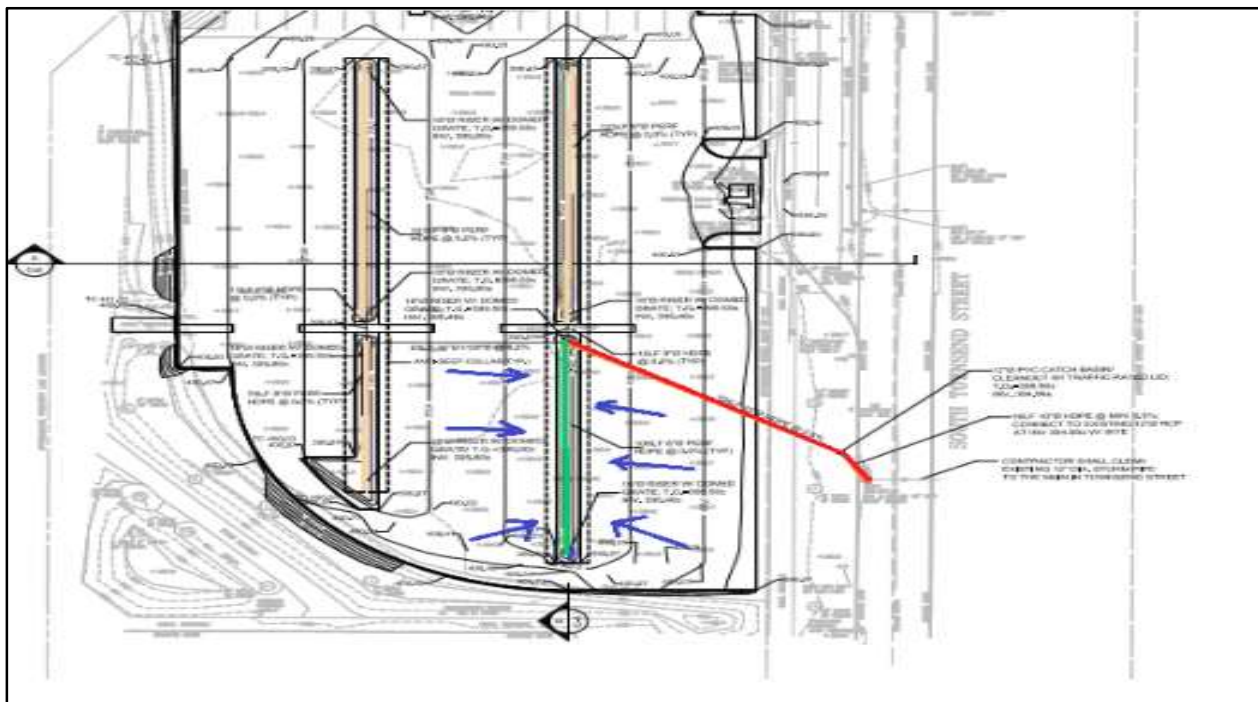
Plan View for S. Townsend Street Parking Lot Infiltration Trench
